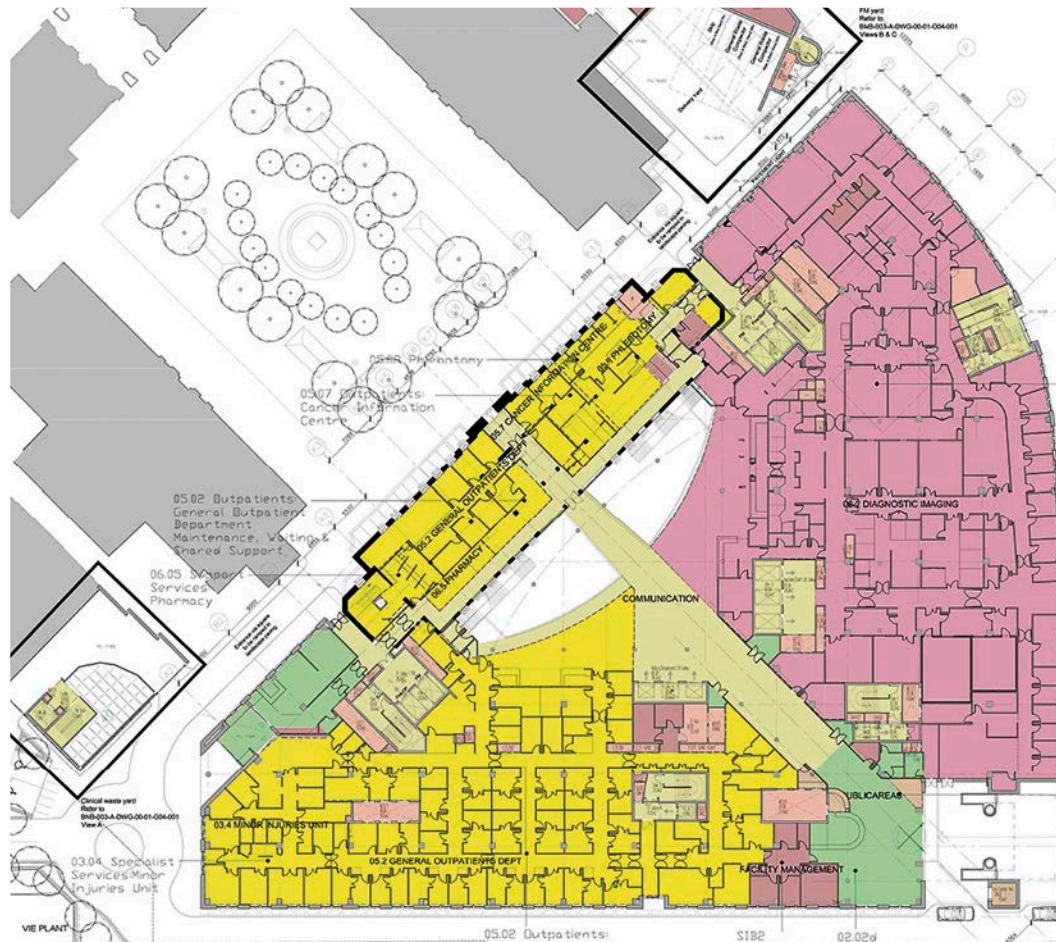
First floor plan—St. Bart's. Source: HOK
